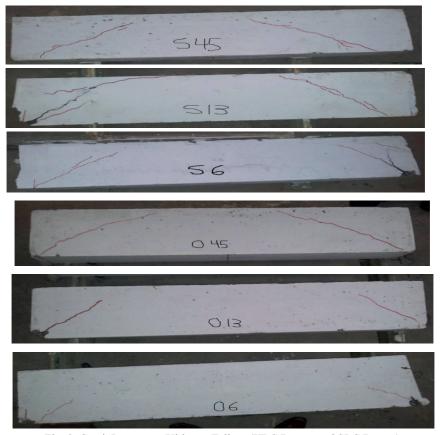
Crack Patterns at Ultimate Failure (HLC Beams and SLC Beams)
